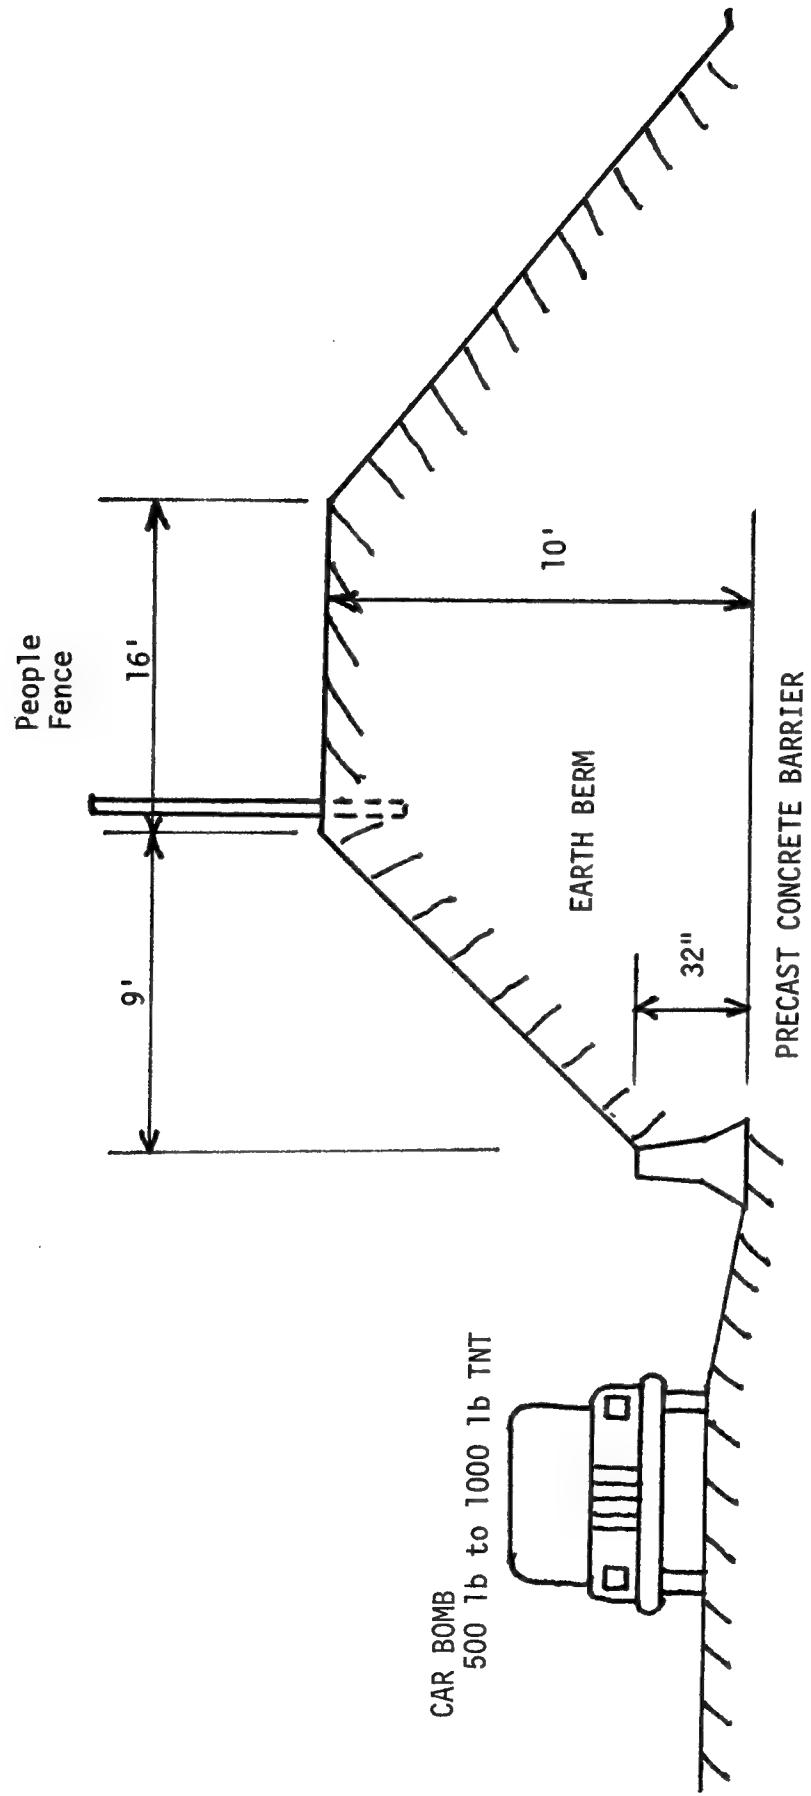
COMBINATION CONCRETE BARRIER AND EARTH BERM BARRIER
